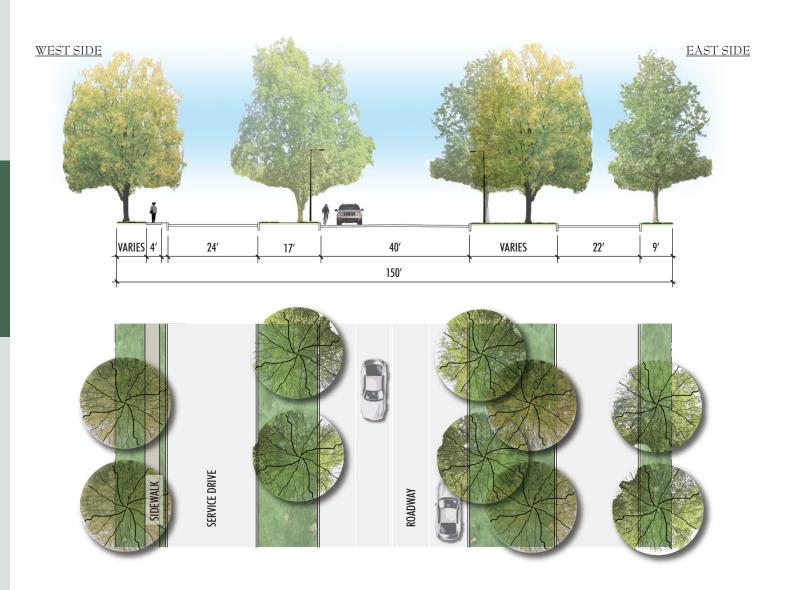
Southern Parkway: Zone 1, 4 & 5 Existing Conditions Section and Plan
